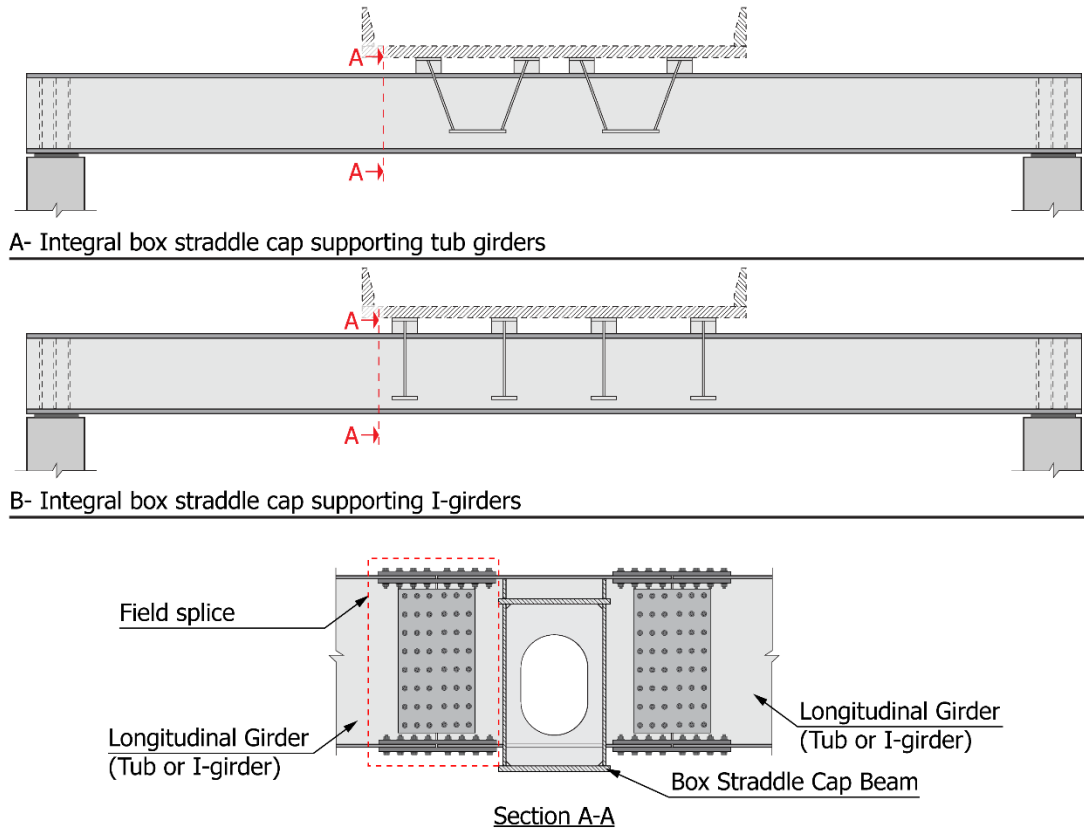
Integral Straddle Caps for (A) steel tub girders and (B) I-girders (adapted from TxDOT drawings)
